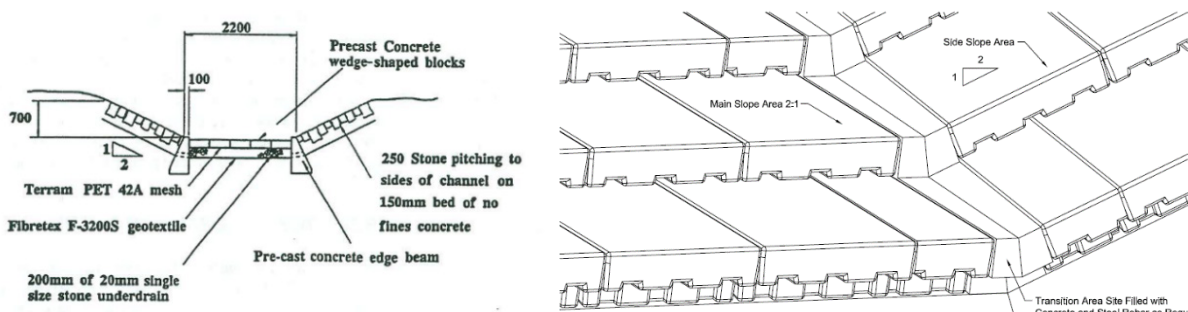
Left: Spillway channel cross-section of the Brushes Clough Dam. Right: Slab-slope joint at the spillway of the Barriga Dam
